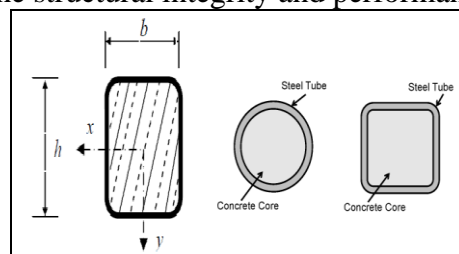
Typical cross sections of Concrete filled Steel Tubes
